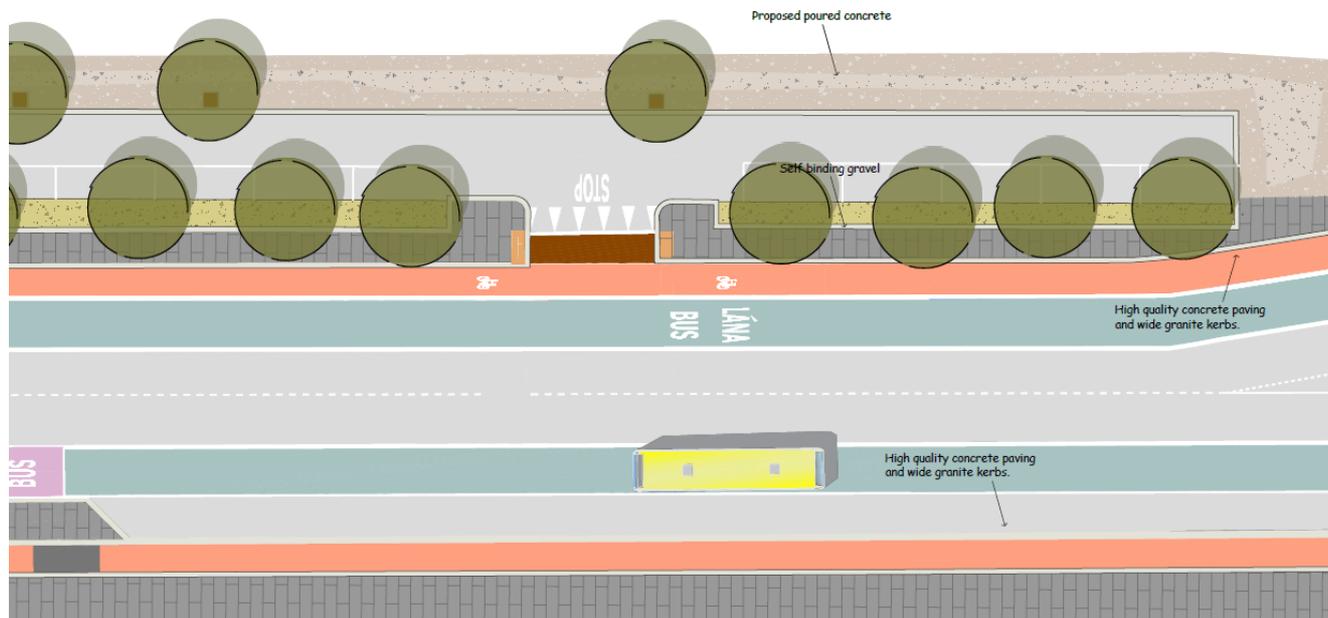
House No. 352 to No. 340 Ballyfermot Road
